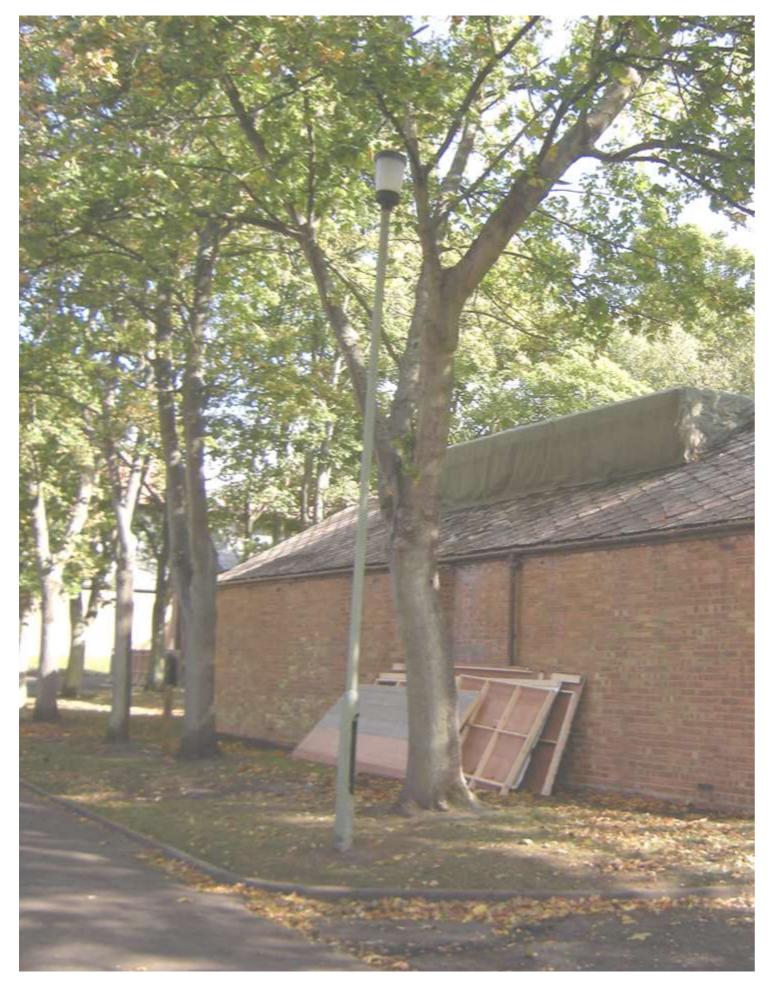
Type and finish of all new external light fittings to be used on all buildings
